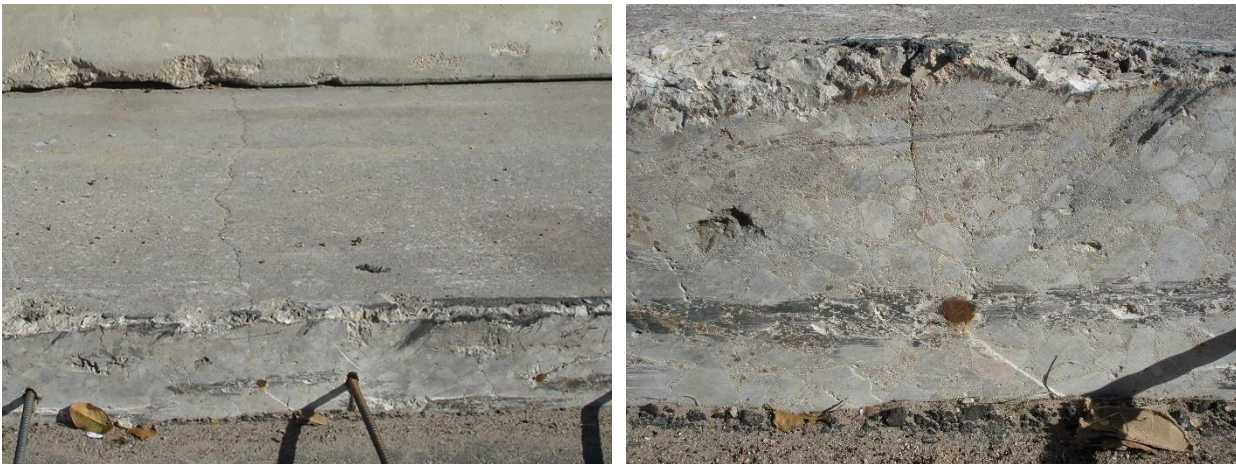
(a) Wide crack width on the slab surface (left); (b) Transverse crack profile through slab depth (right)
